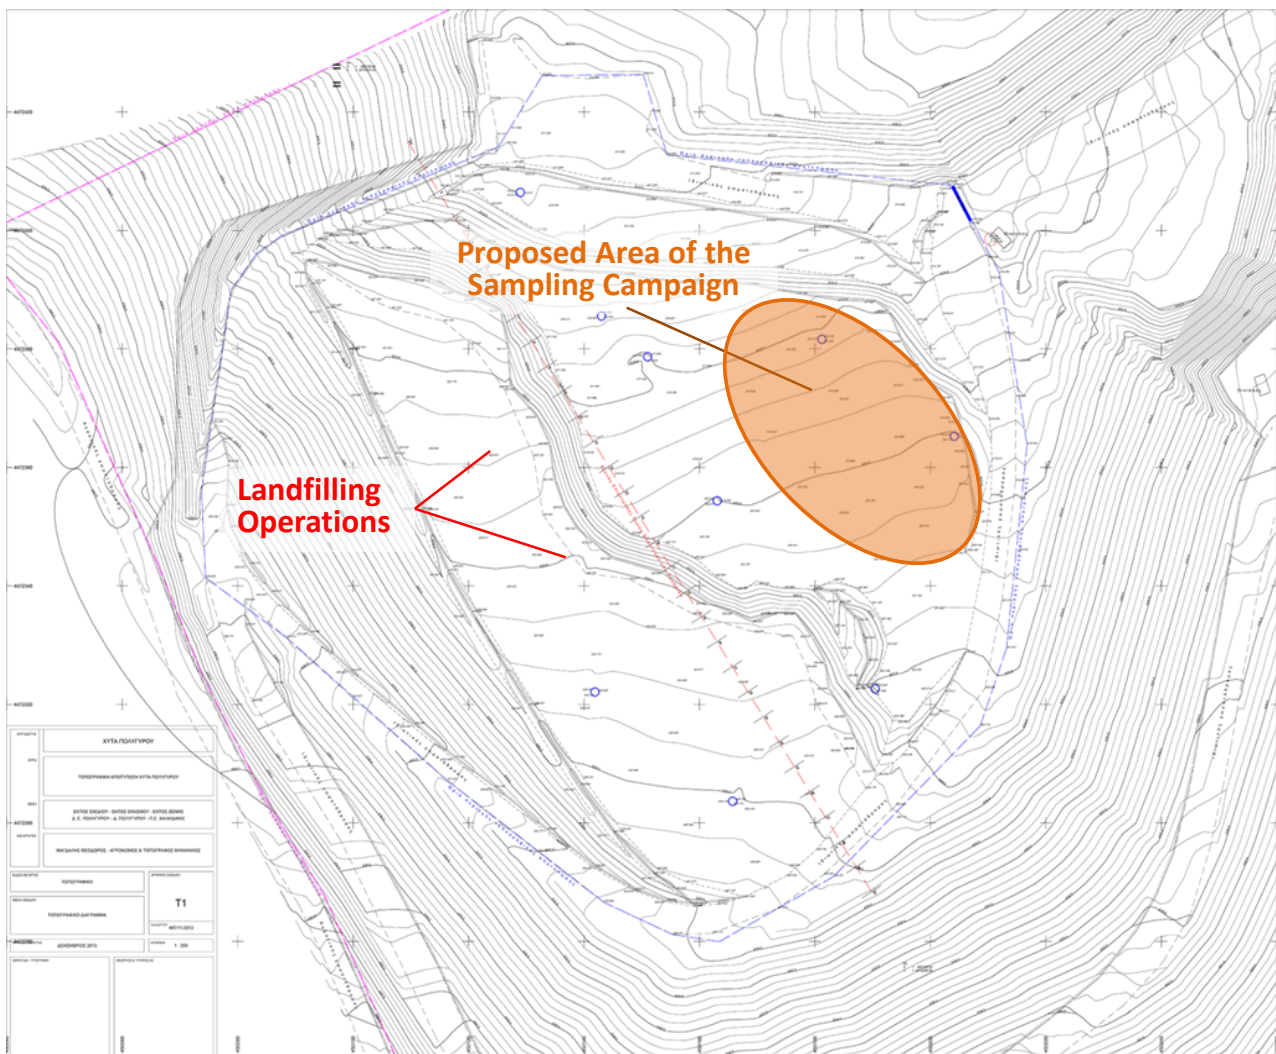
Proposed location of the development of the sampling campaign (trench excavations).
